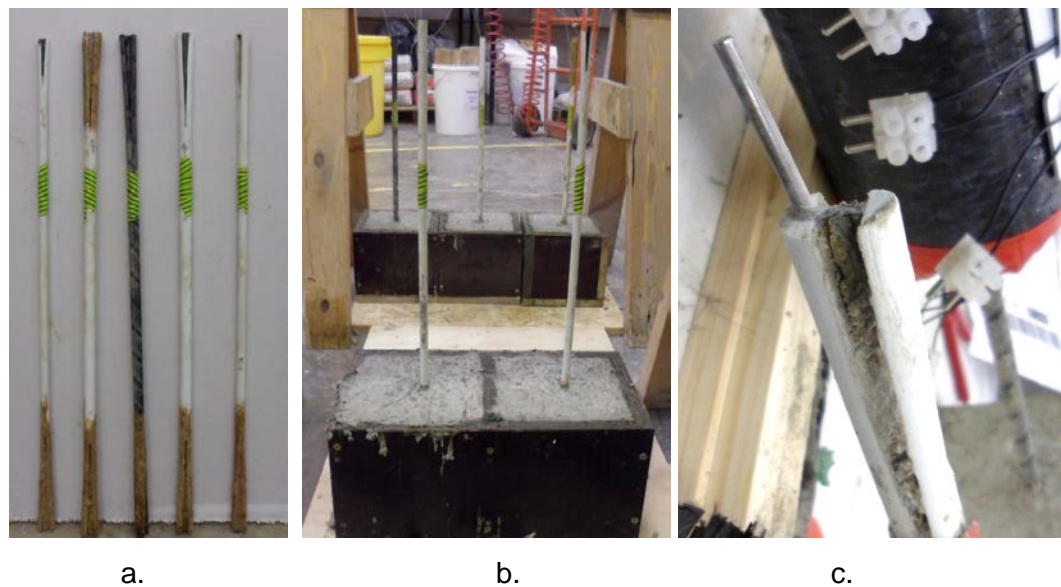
Split prism test specimen: (a) side view, (b) top view and (c) slip measurement
